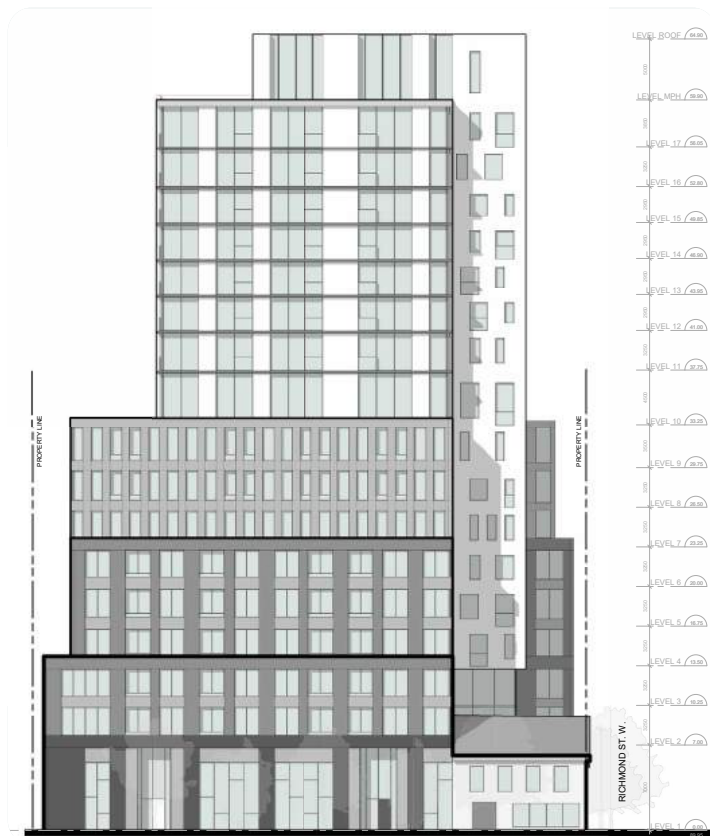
East Elevation (Prepared by Kirkor Architects)
